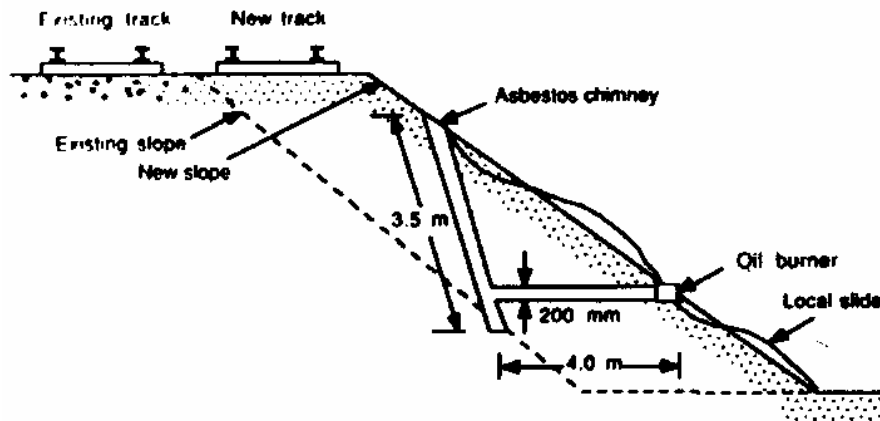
Kanazawa Railroad Embankment Site (Hausmann, 1990)
